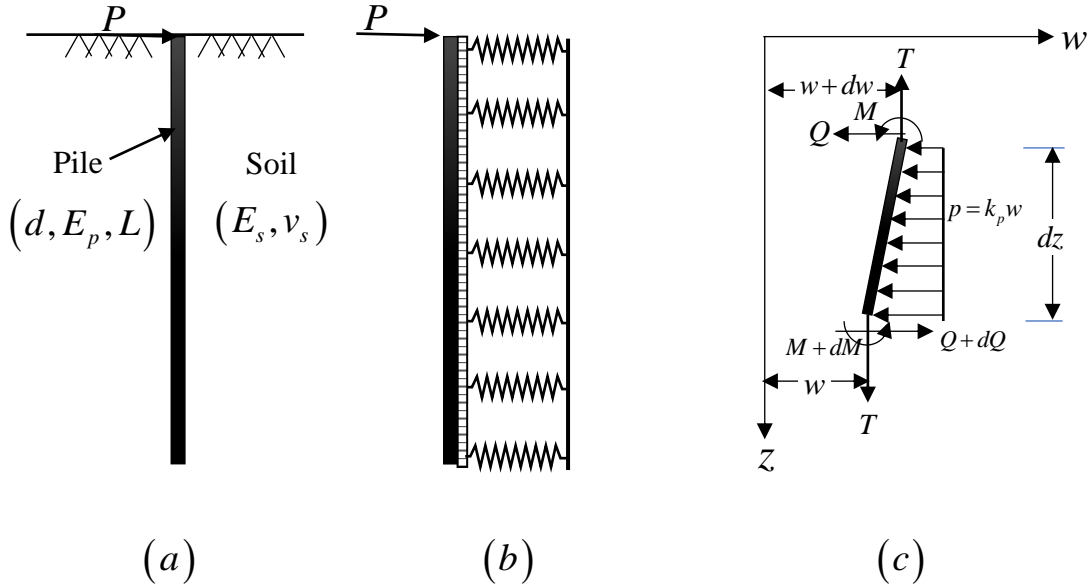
Schematic of (a) single pile (b) laterally loaded pile supported by two-parameter subgrade (c) a pile element
